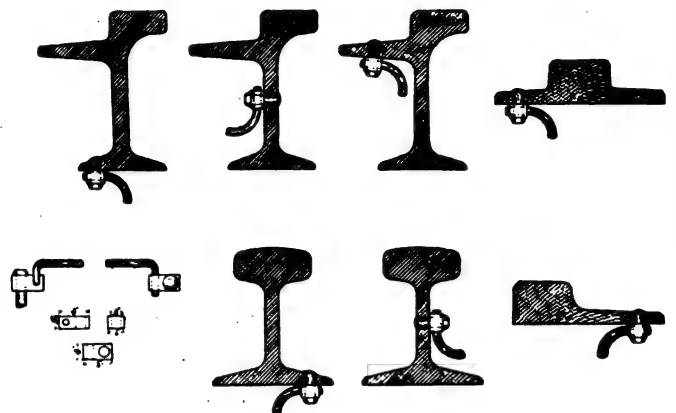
METHOD OF CONNECTING GROUND WIRE TO RAIL.
